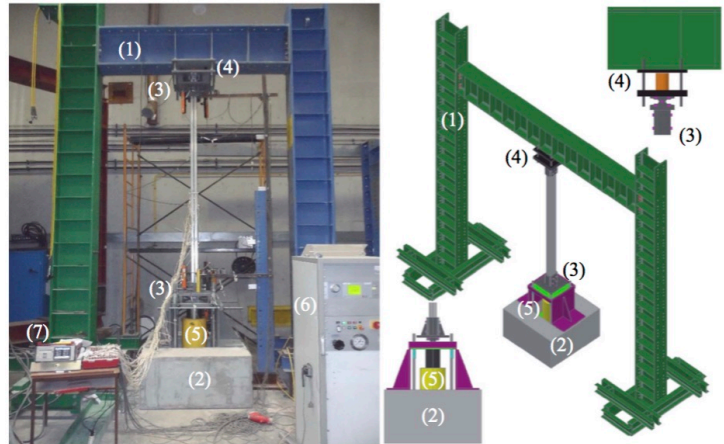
Experimental test set-up built for buckling tests. (a) general view. (b) schematic view.
